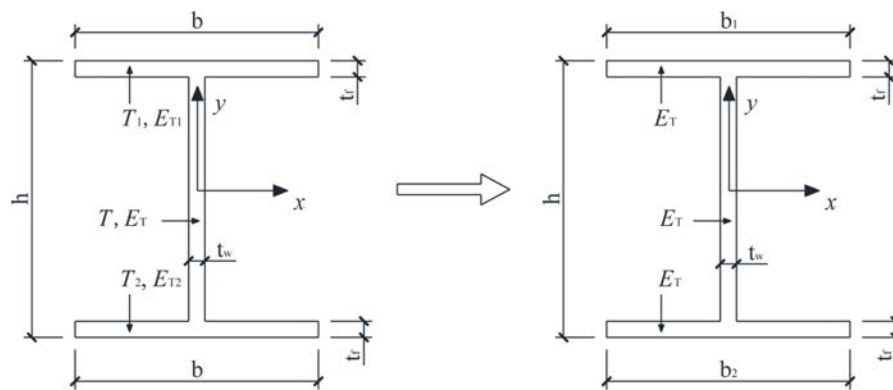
Dimensions of original and equivalent cross sections of the steel beam.
